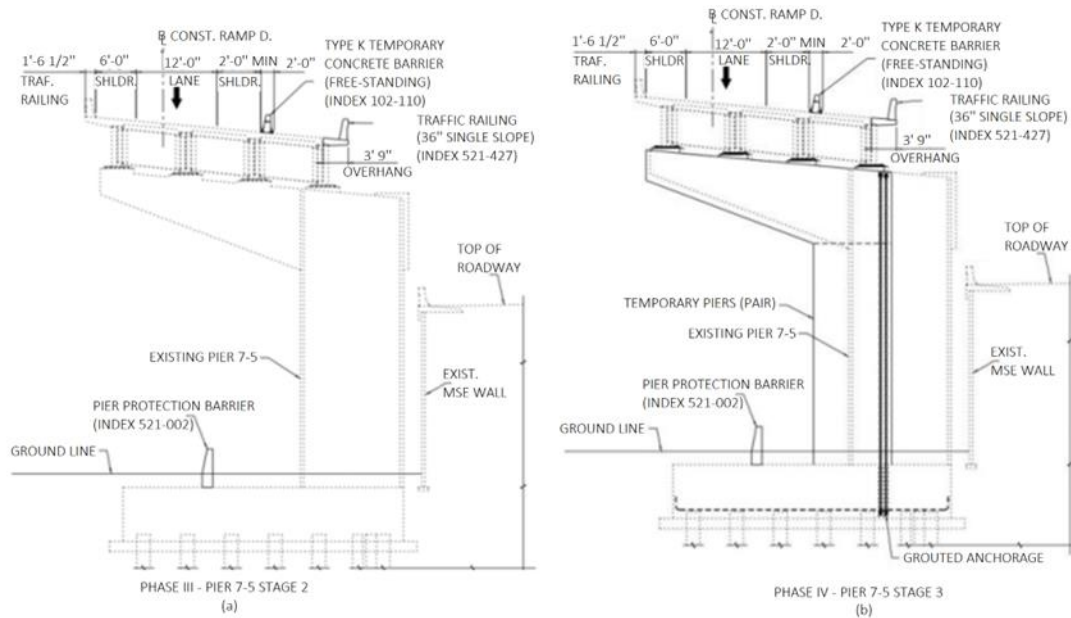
Unit 2, newly constructed superstructure (a) and temporary piers (b)
